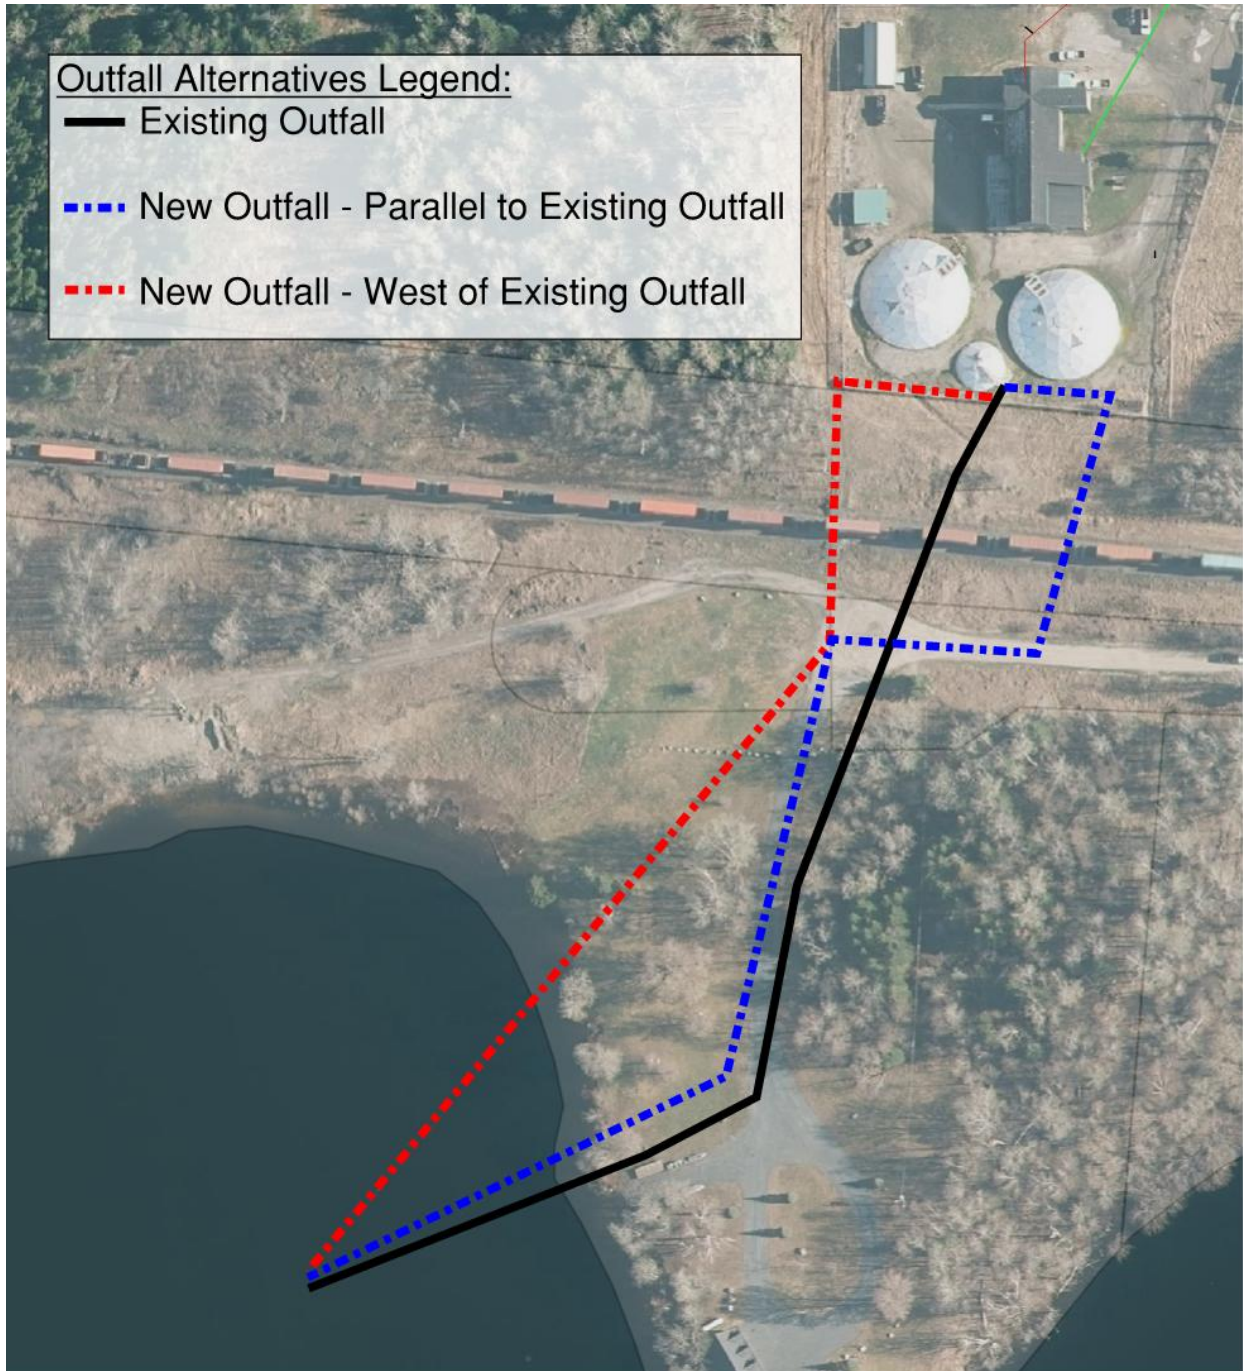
Existing Outfall and Shortlisted New Outfall Alternatives
